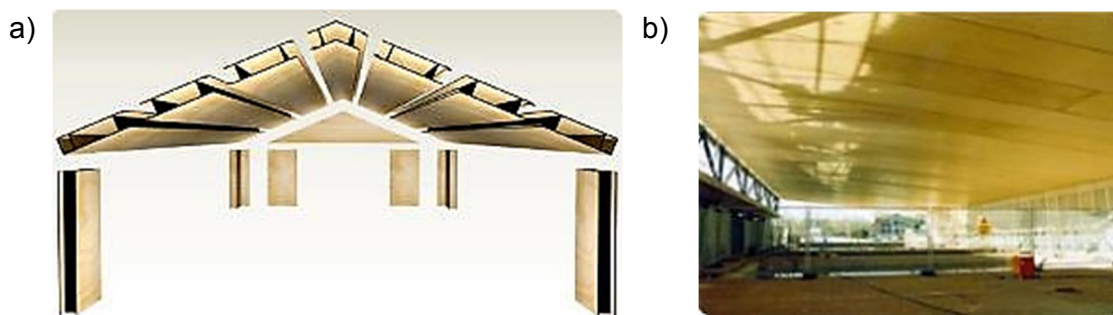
a) Roof and wall system using Cowley's monocoque panels. b) Large span covered with Cowley monocoque panels at Darlastan. Images from ([www.cowleytimberwork.co.uk](http://www.cowleytimberwork.co.uk)).
